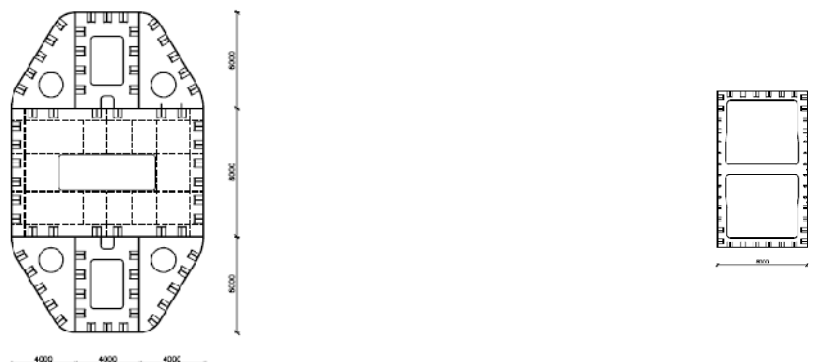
Left hand side: tower section geometry investigated in wind tunnel, right hand side: cross beam section geometry.
